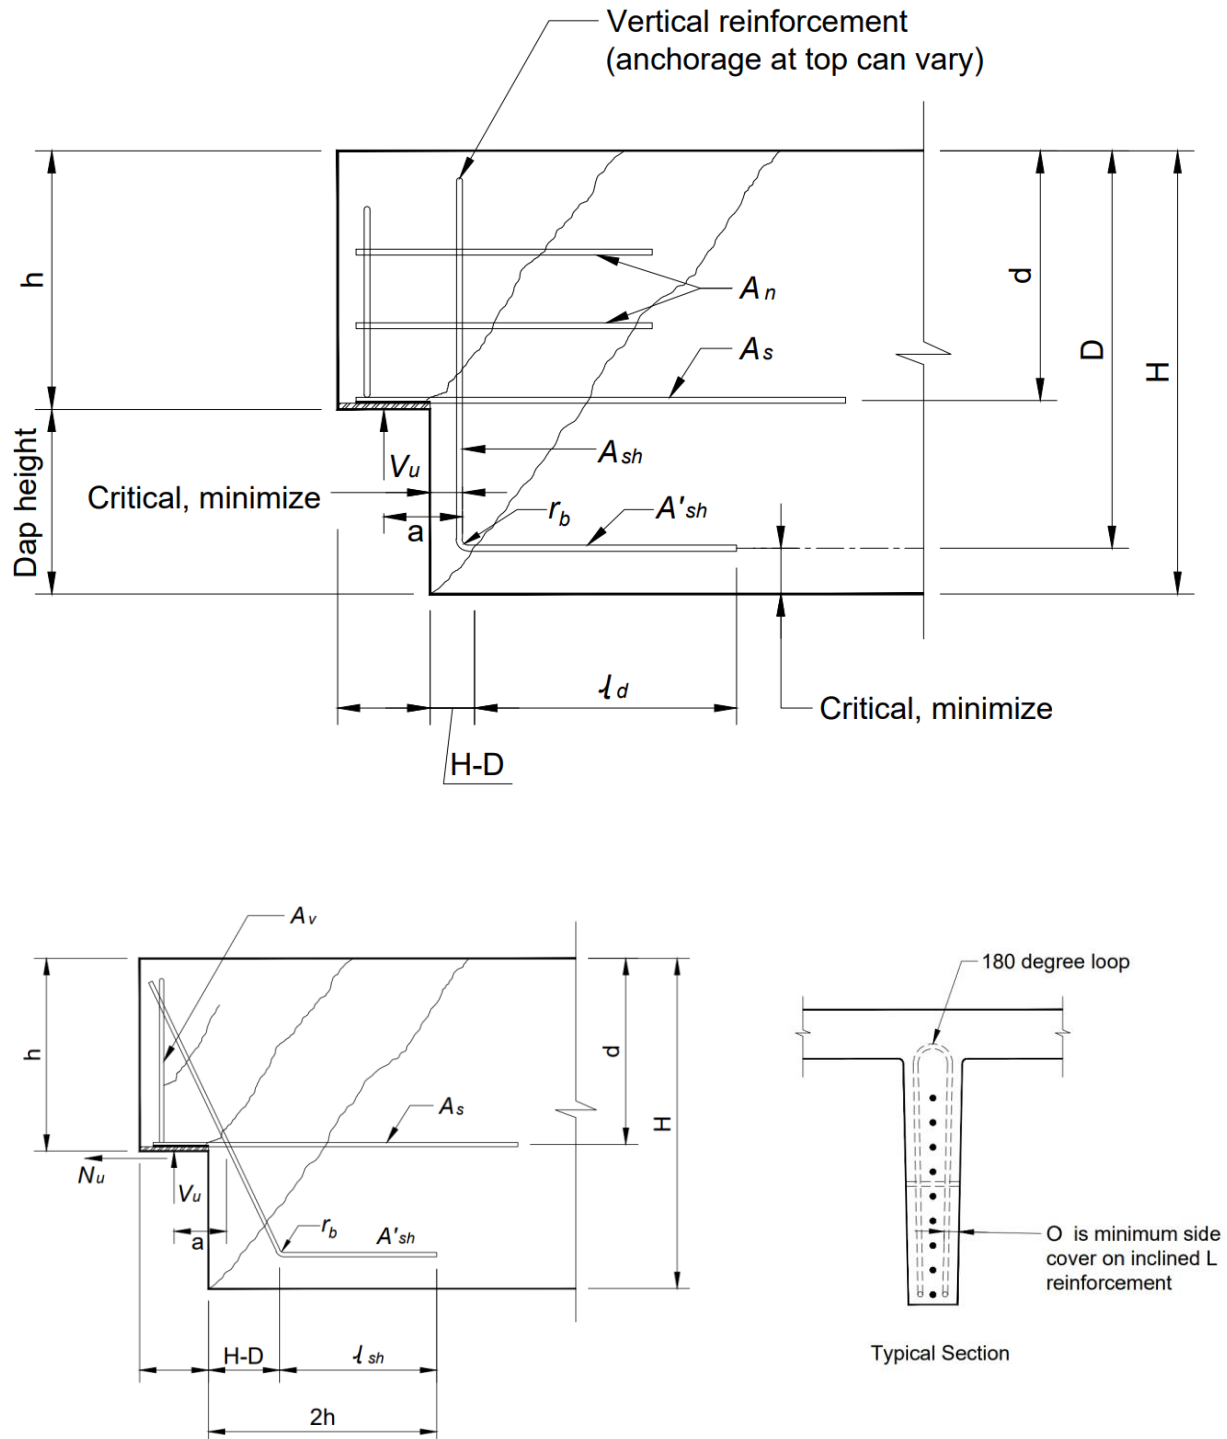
POTENTIAL FAILURE MODES AND REQUIRED REINFORCEMENT IN THIN-STEMMED DAPPED ENDS
